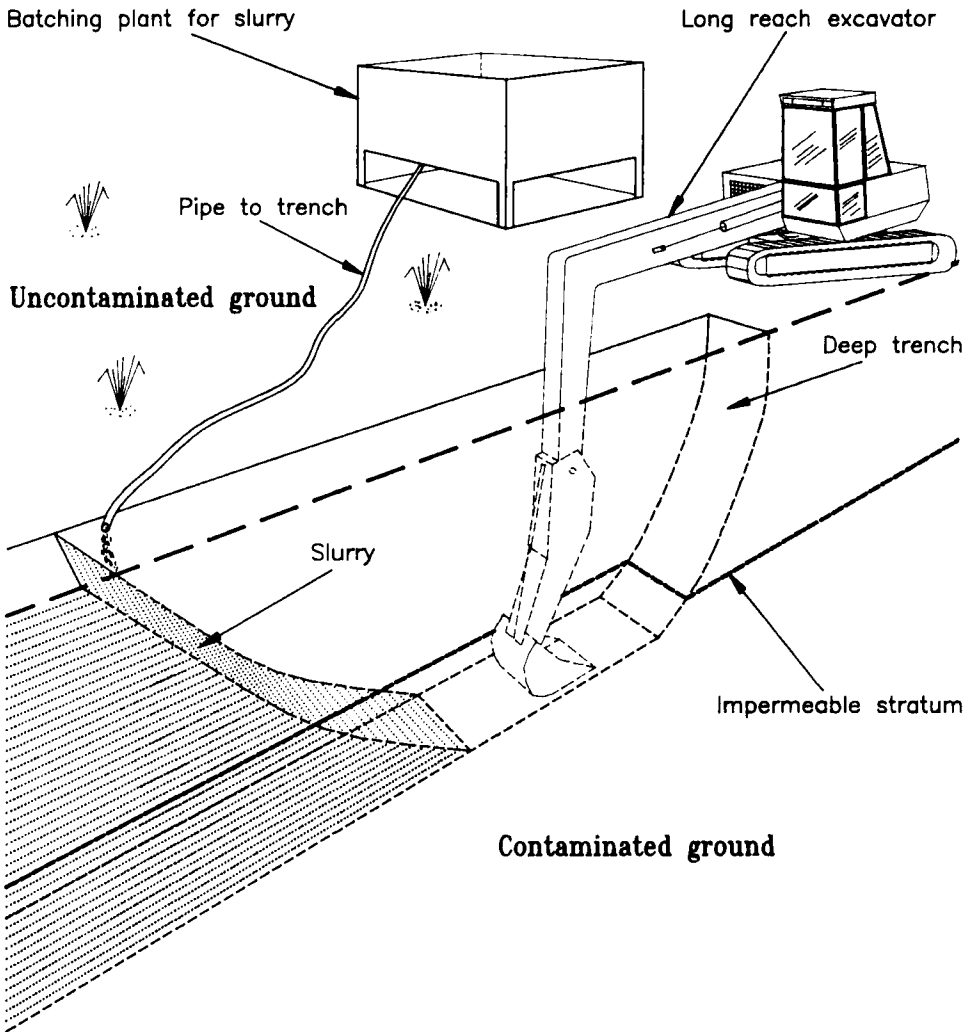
Construction of a slurry wall for vertical containment of polluting materials
